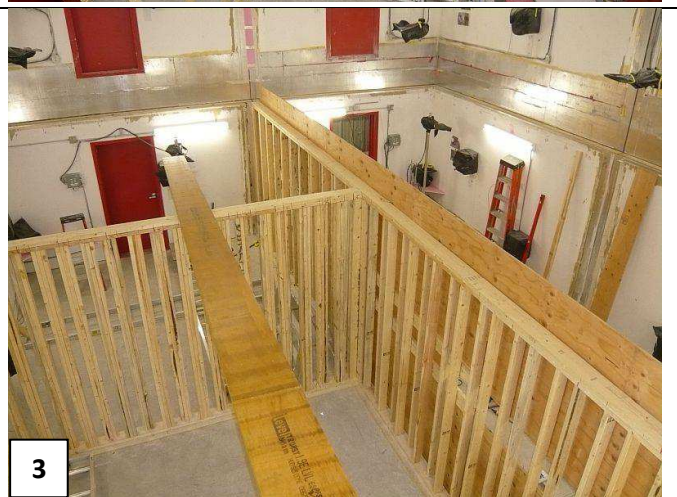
shows some images of a wood-framed specimen during construction.
